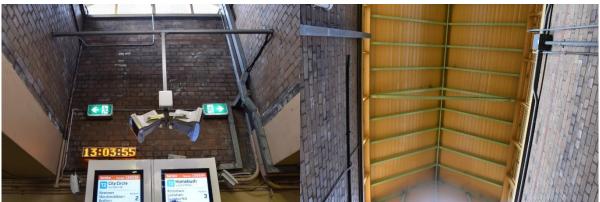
Looking back to the rear subway wall, beneath the lantern on platform 1/2, unrendered brick in this section (Source: Artefact, 2021)
